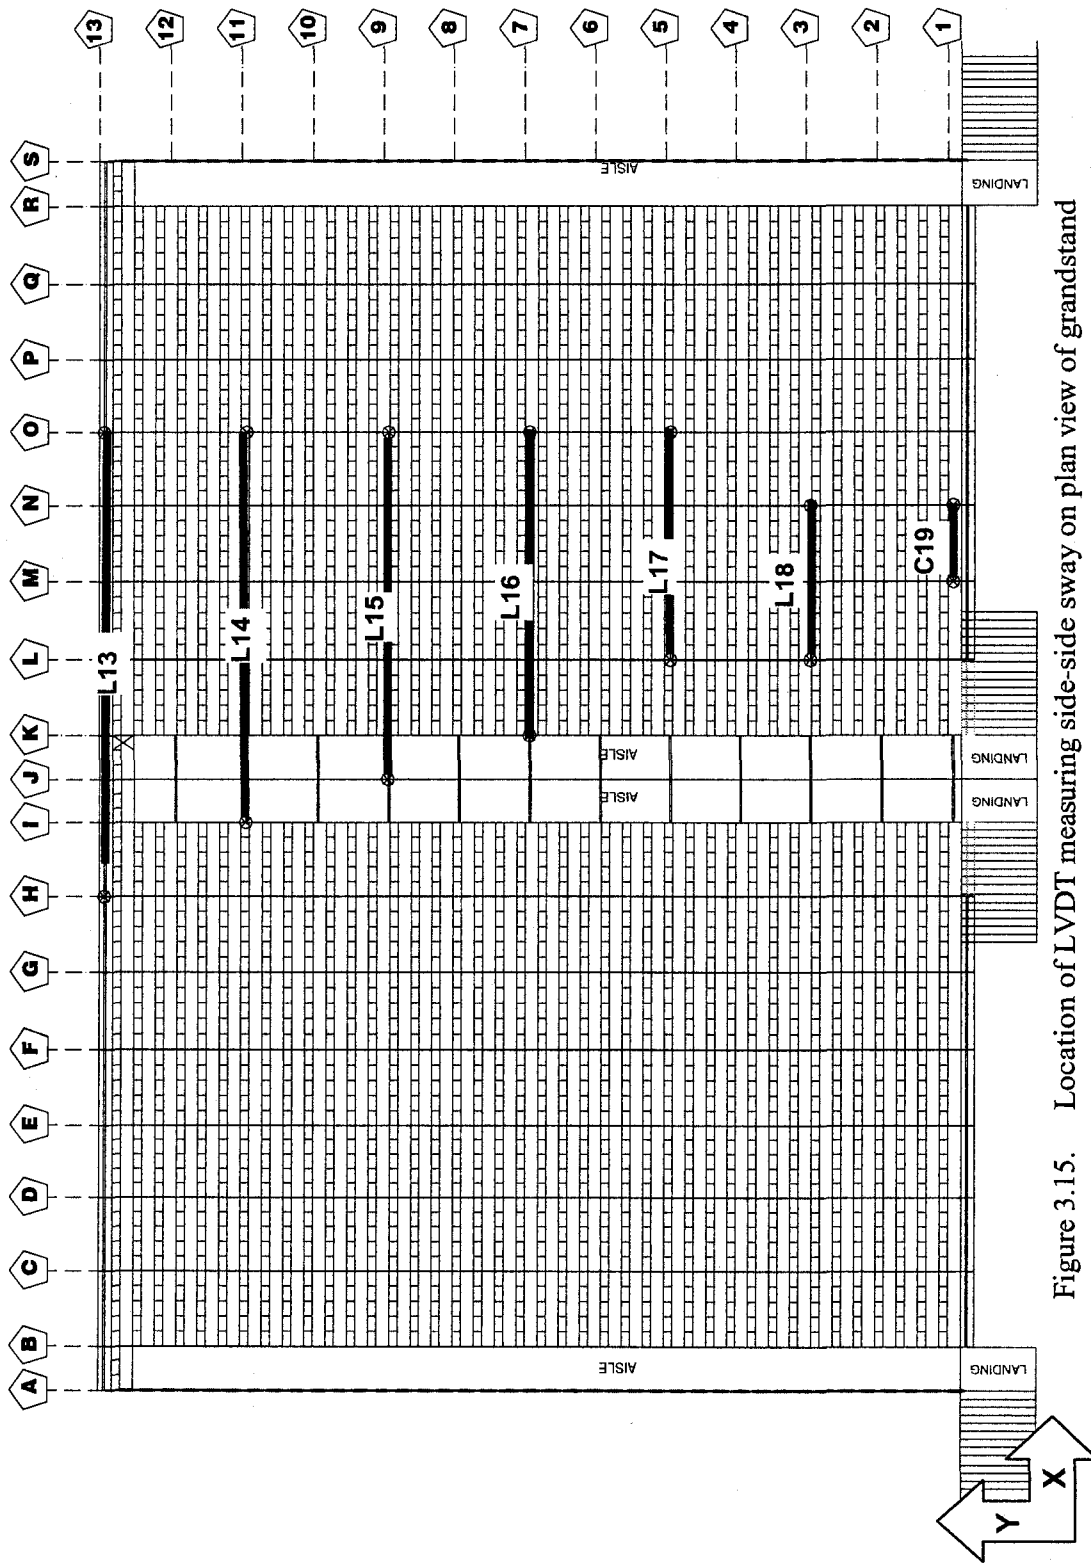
Location of LVDT measuring side-sway on plan view of grandstand
